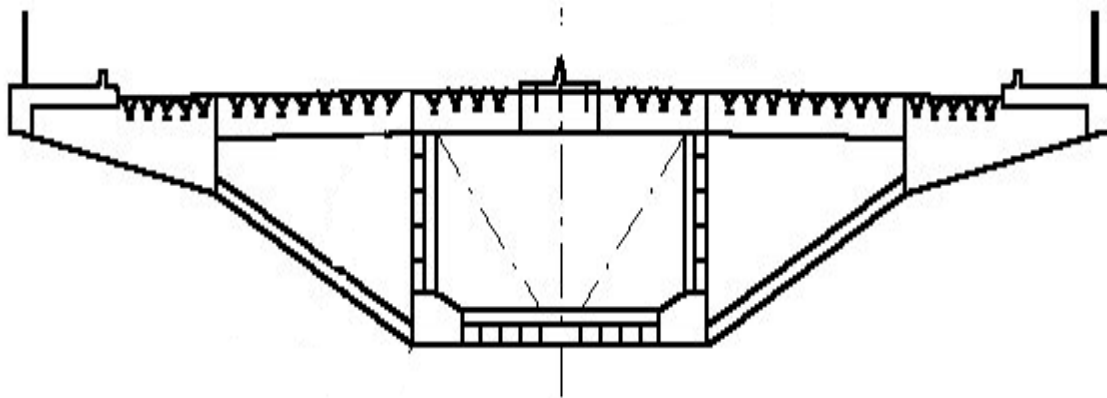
Orthotropic steel deck over single steel box girder bridges
